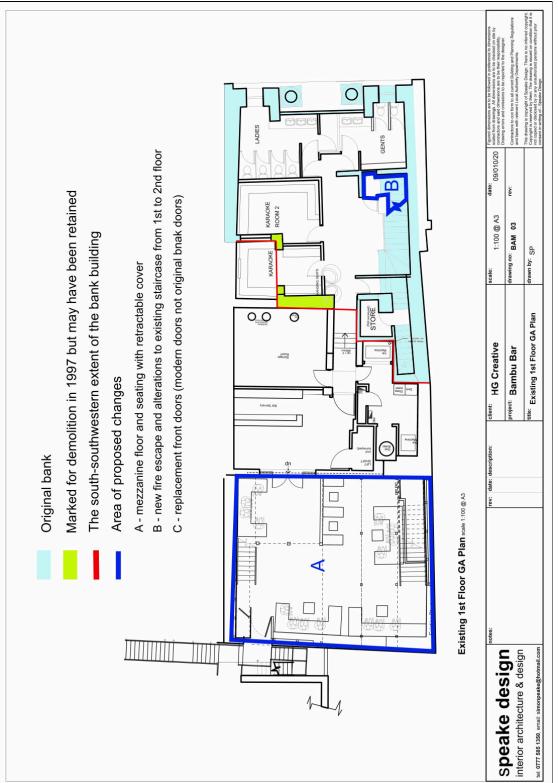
; A plan of the first floor showing original and modern fabric. The location of the mezzanine is marked A and would not impact on the surviving historic fabric of the building. The stairwell/fire escape is marked B.
